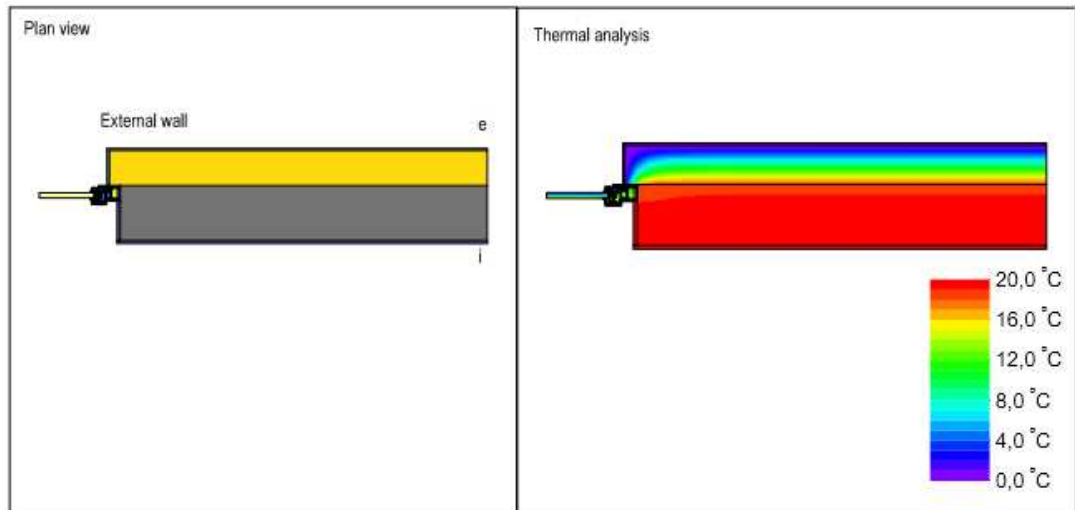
Timber frame lay-up with wooden façade. Structure source: Dataholz 2014
